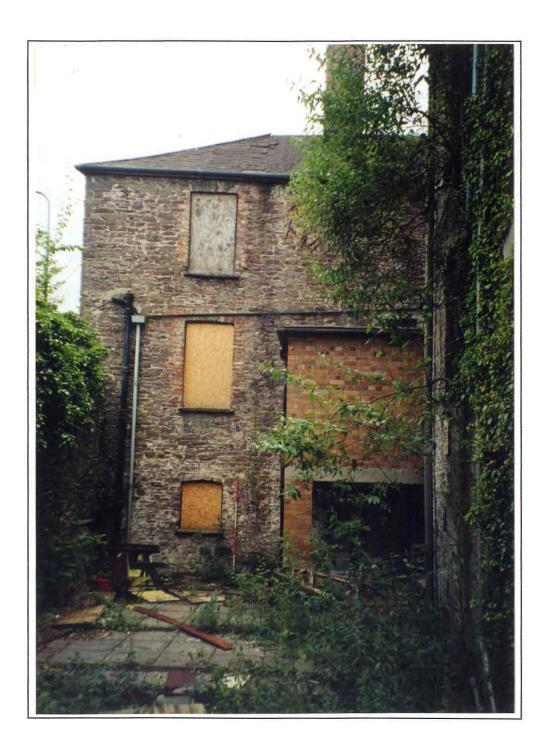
No. 14 Castle Street (PRN 25130) rear wing and yard. Photo CPAT 977.15
